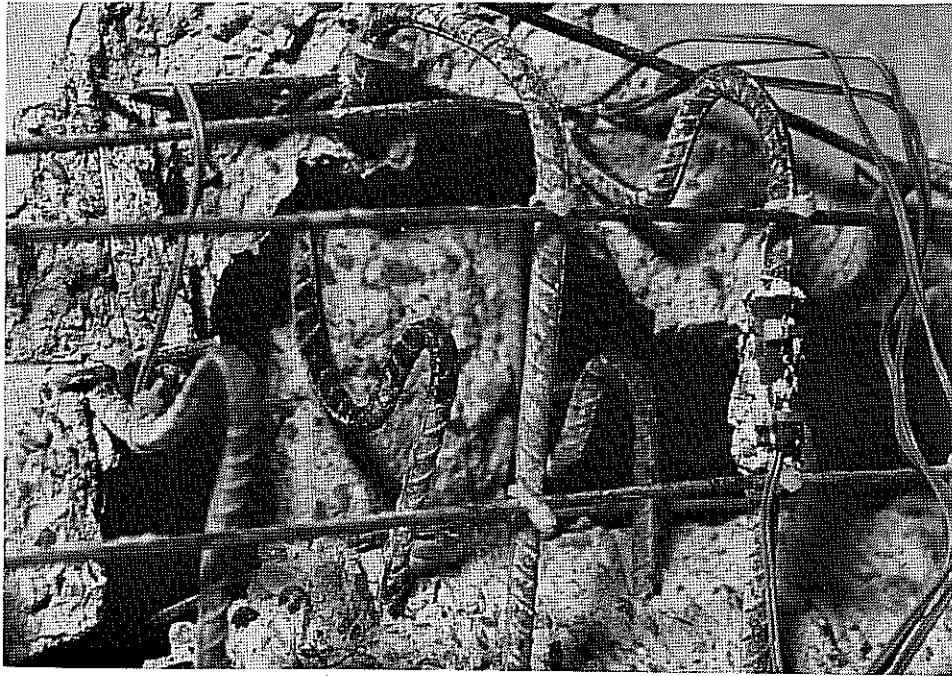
Specimen 3M14 Reinforcement in Failure Zone
